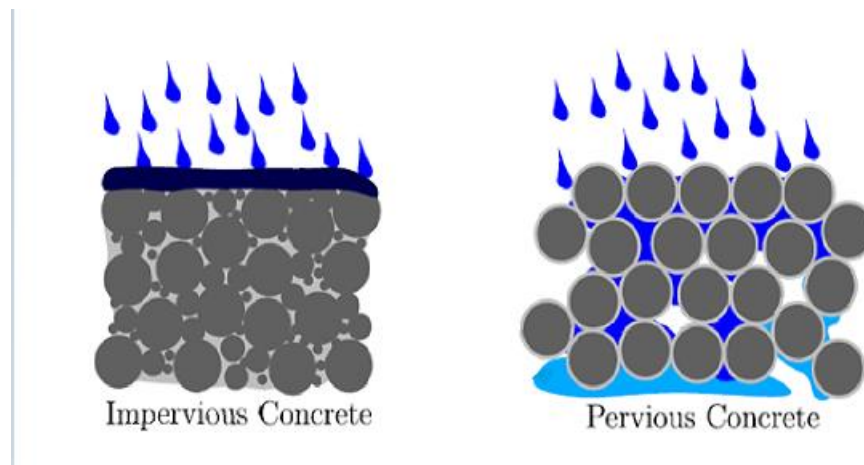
Drainage of water through pervious concrete (Zhong et al., 2018)
